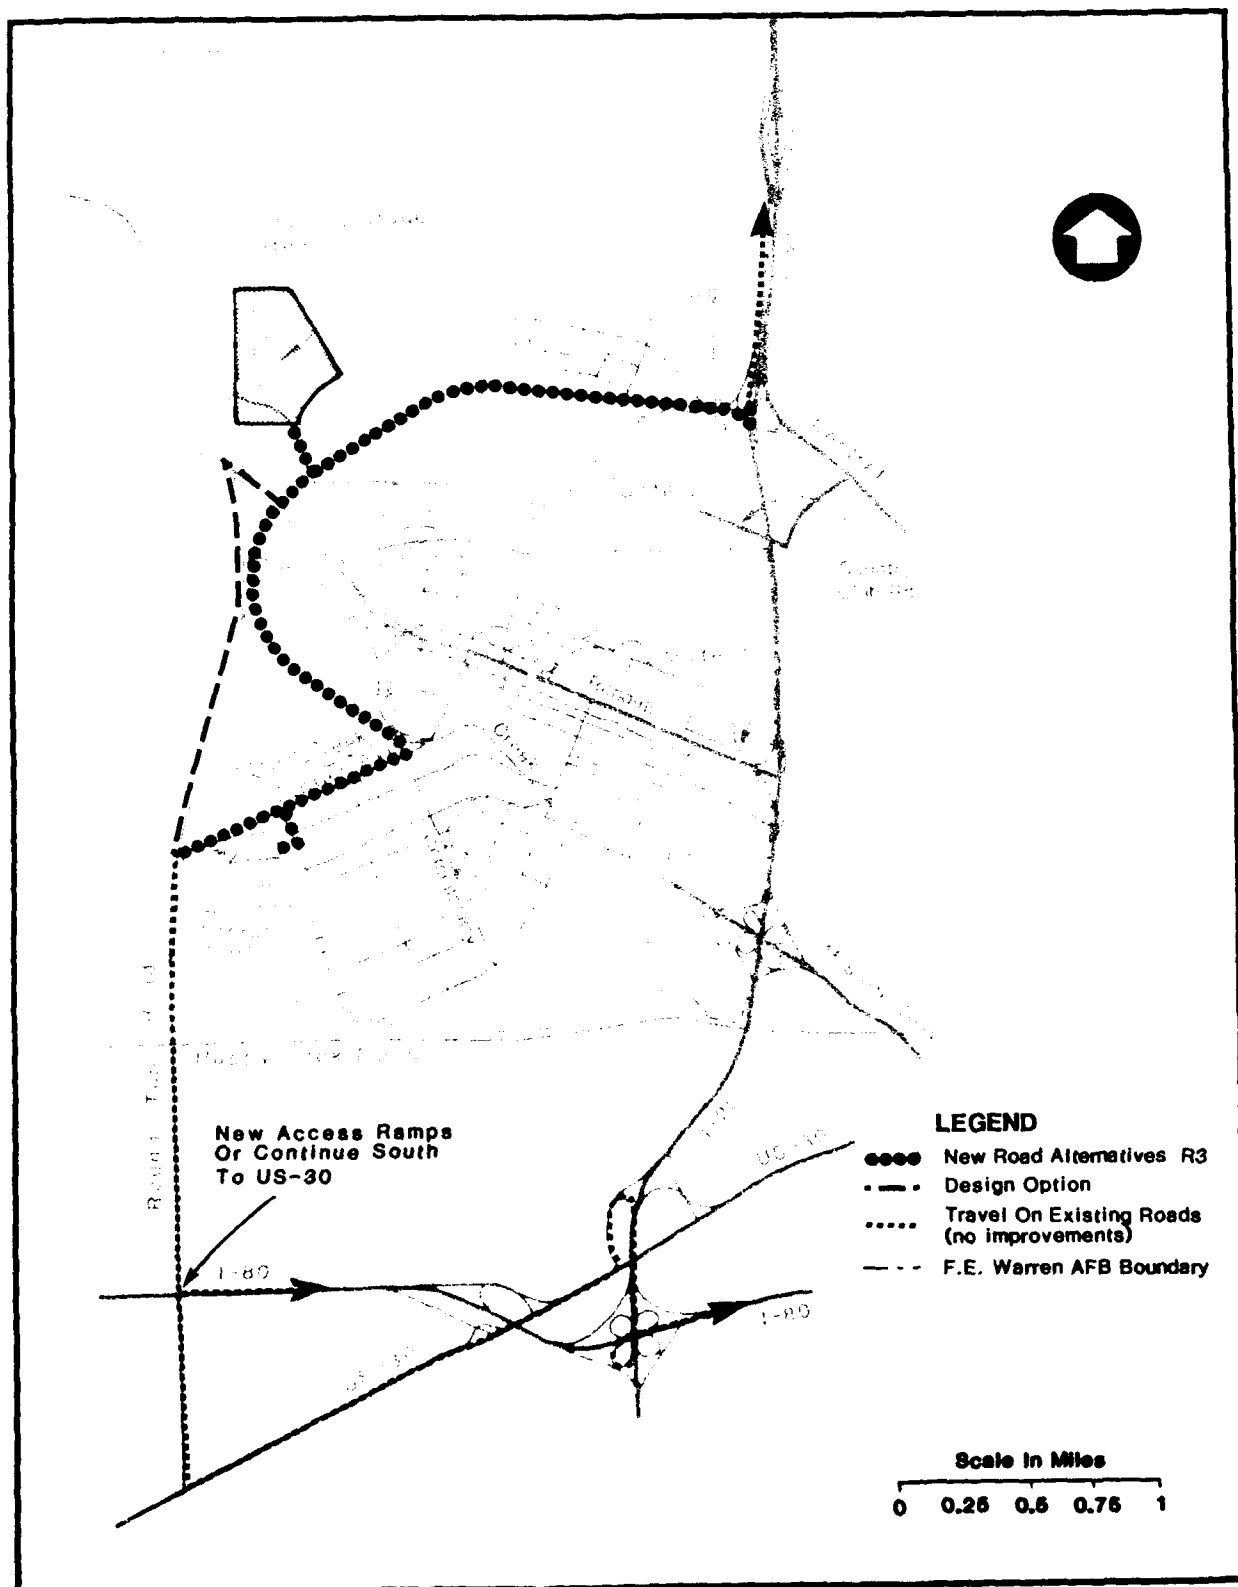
NEW ROADS AT F.E. WARREN AFB: ALTERNATIVE R3
